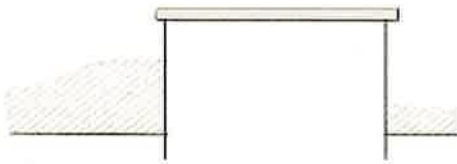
NO. Existing landscape contours have been leveled and building sits high above the skyline, bringing more attention to the building than to the scenic, rural context.
